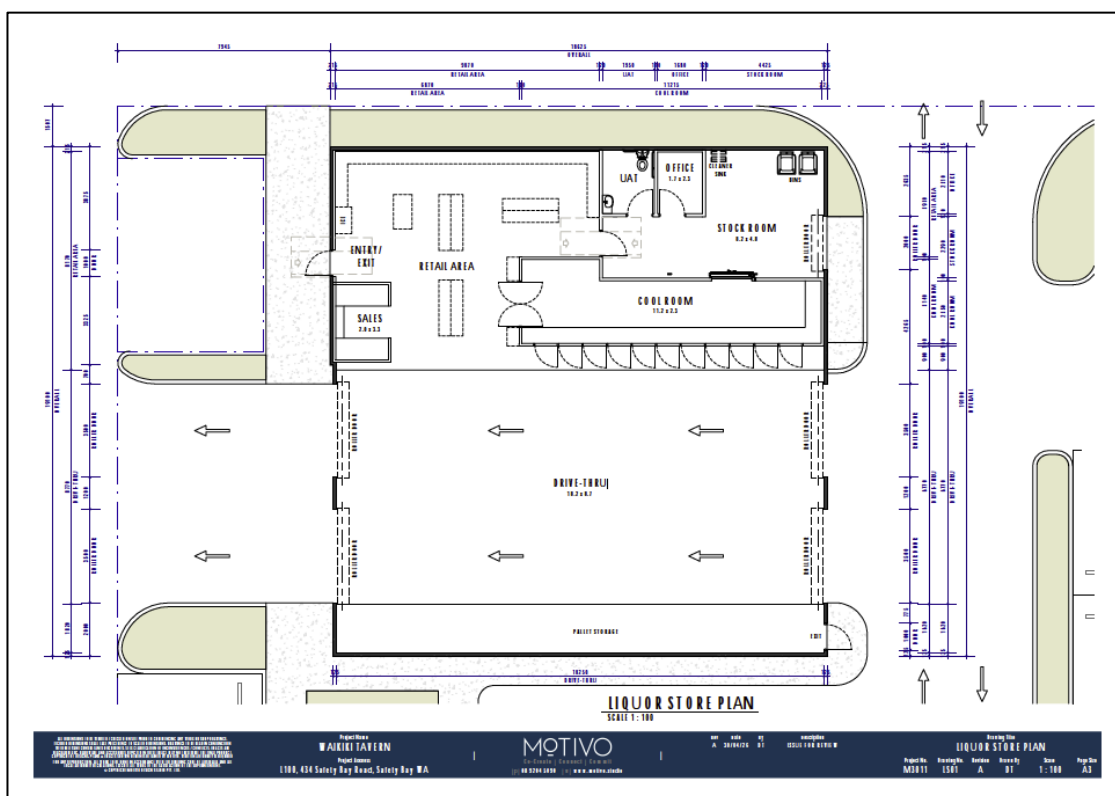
Floor Plan of Proposed Liquor Barons Safety Bay
